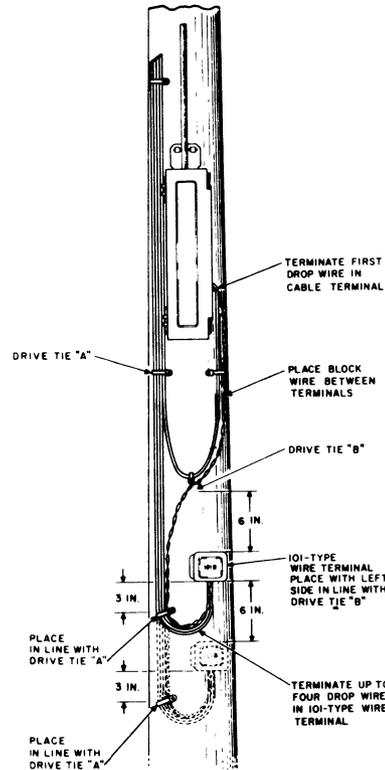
Wiring 101-Type Terminal at Pole-Mounted Cable Terminal
